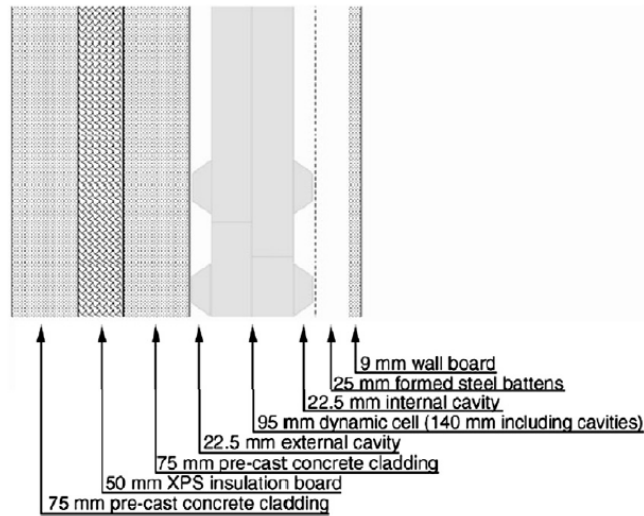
QSAS wall construction layers (Source: El-Sarrag, and Al-Horr , 2012)
